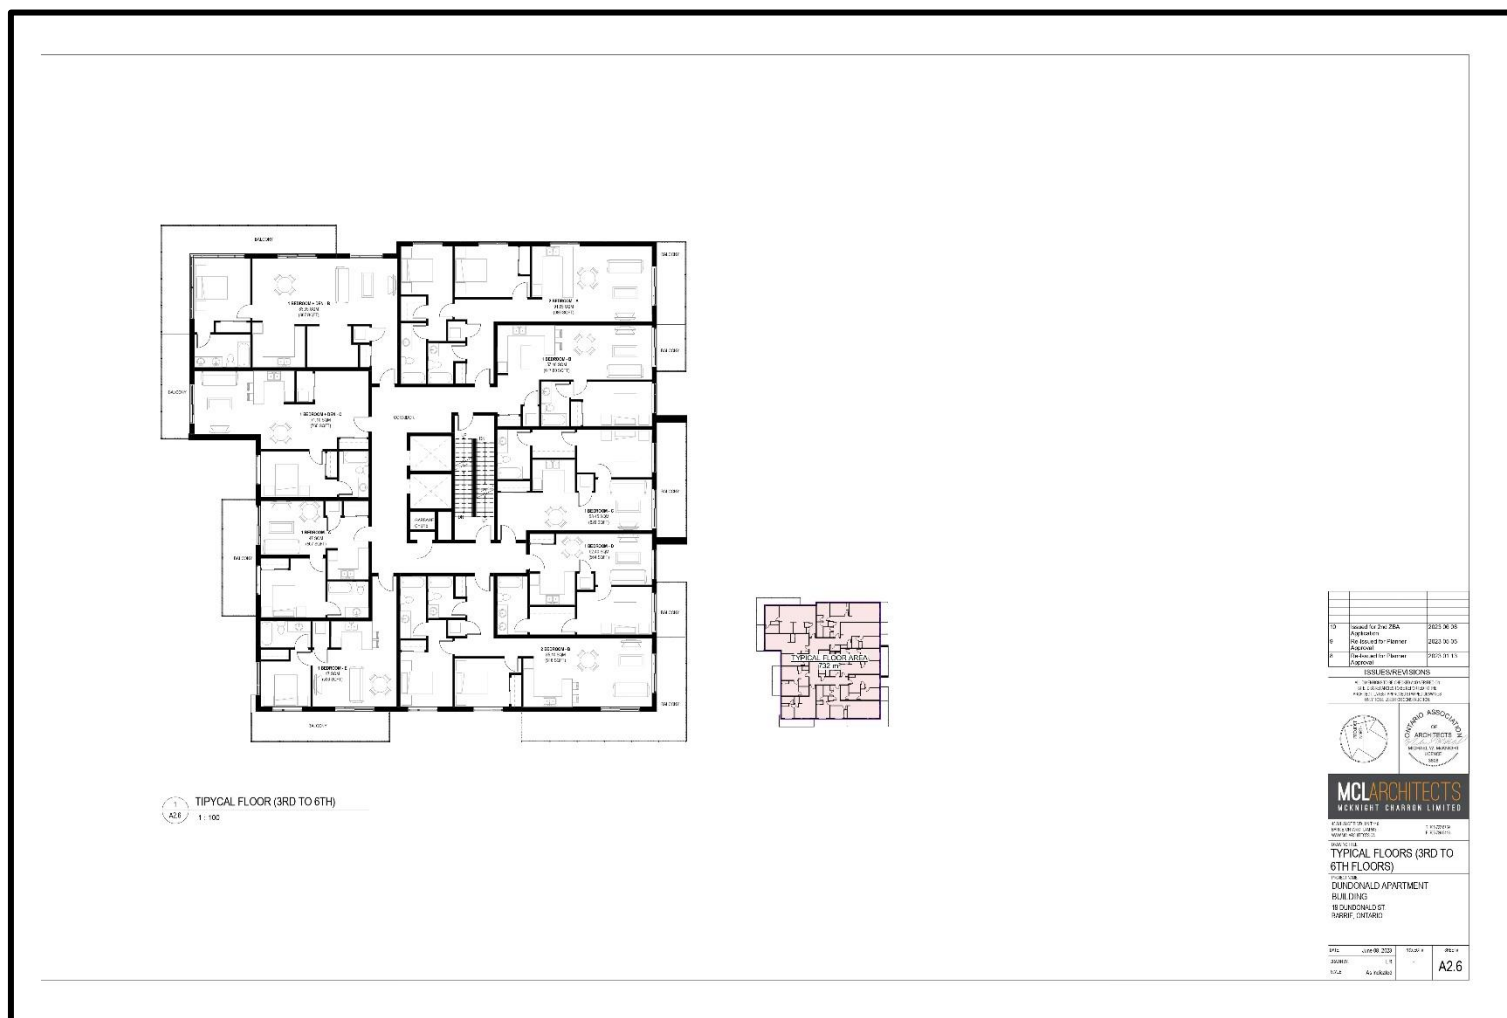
Proposed Development – Typical Floor Plan (Third to Sixth Floor)
